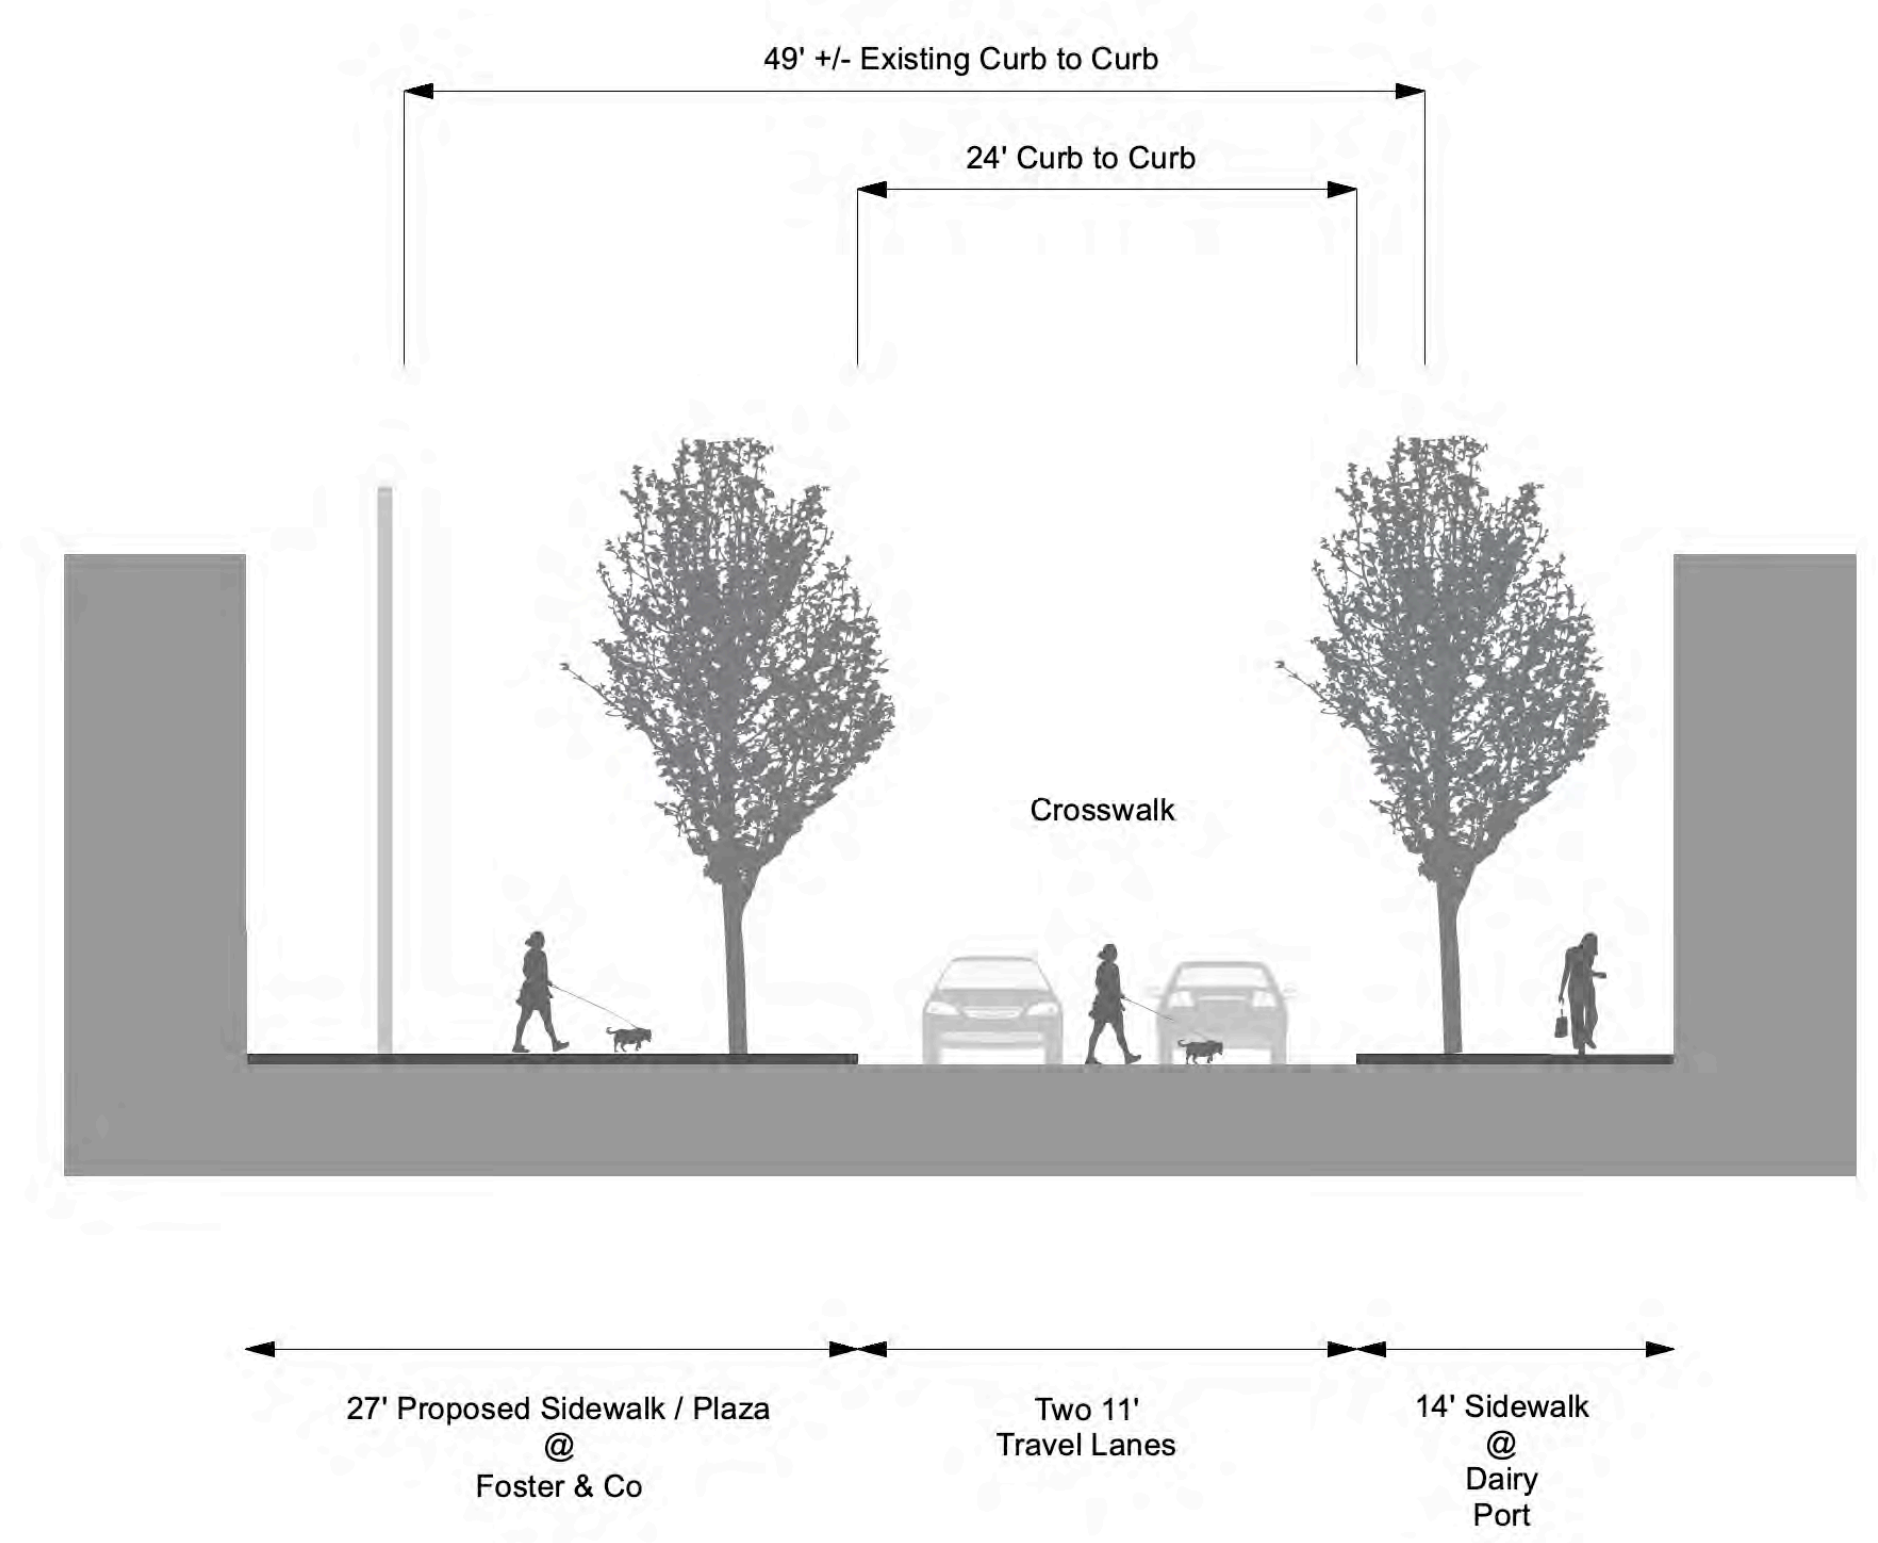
Main Street Roadway Cross Section at Dairy Port
